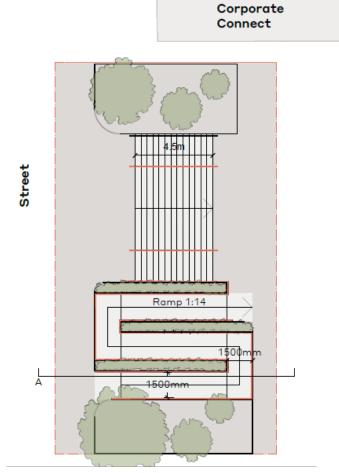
Indicative pedestrian connection (stairs and accessible ramp)
